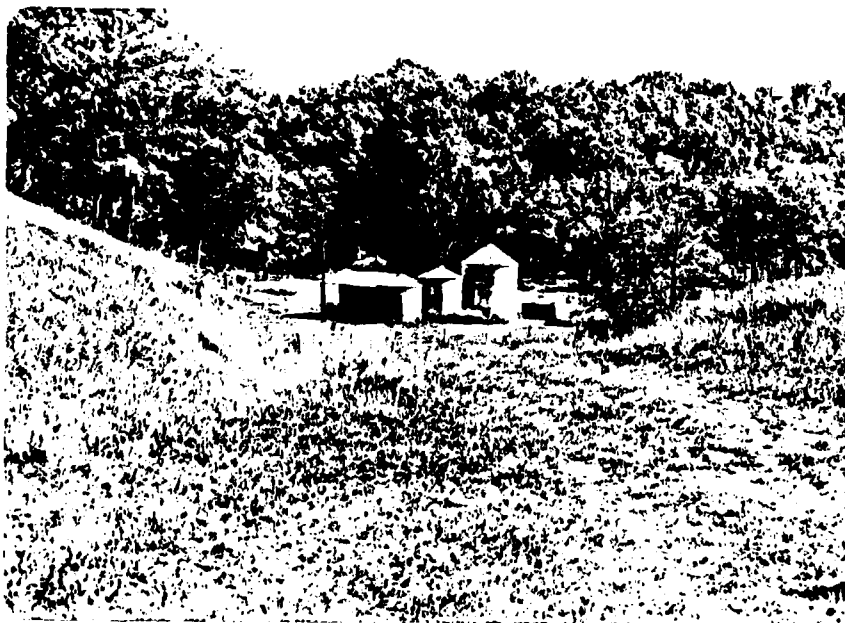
View of emergency spillway discharge channel taken at spillway crest.
